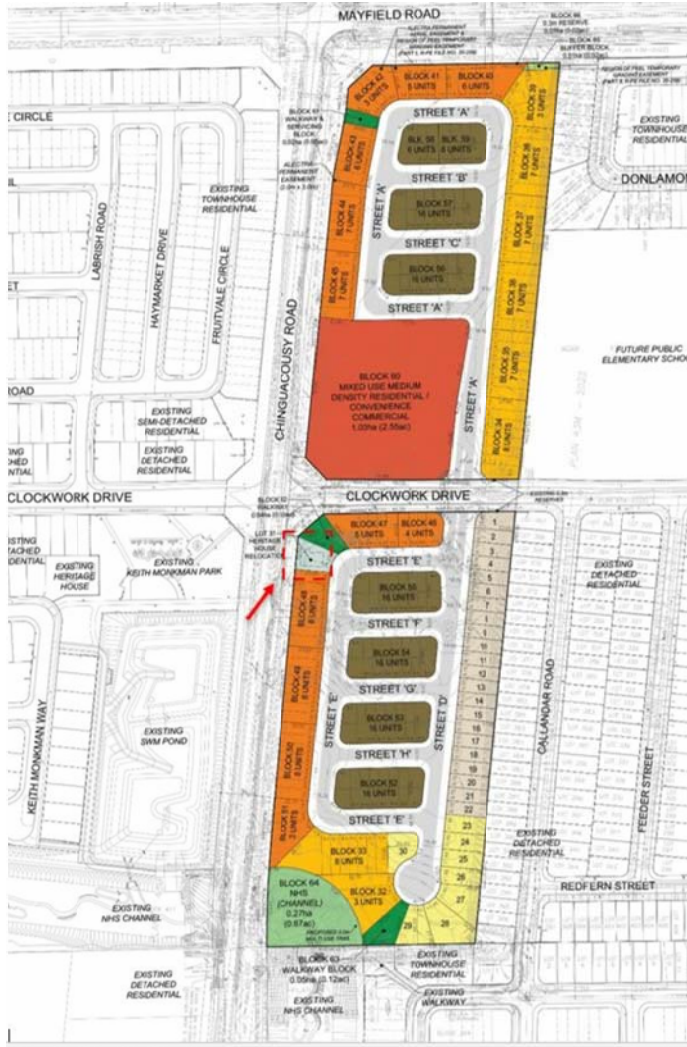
Proposed Draft Plan of Subdivision of the new mixed-use development showing the relocated Heritage Resource (GSAI, 2021. Annotated by AREA)
